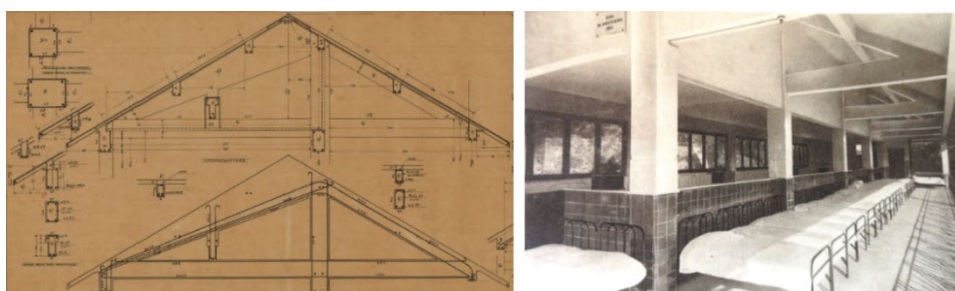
The original drawing of reinforced concrete roof and photo of triangular corbels.
